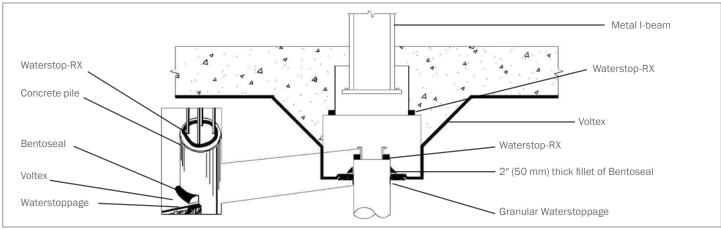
Pile Cap Detail (Hydrostatic condition).
